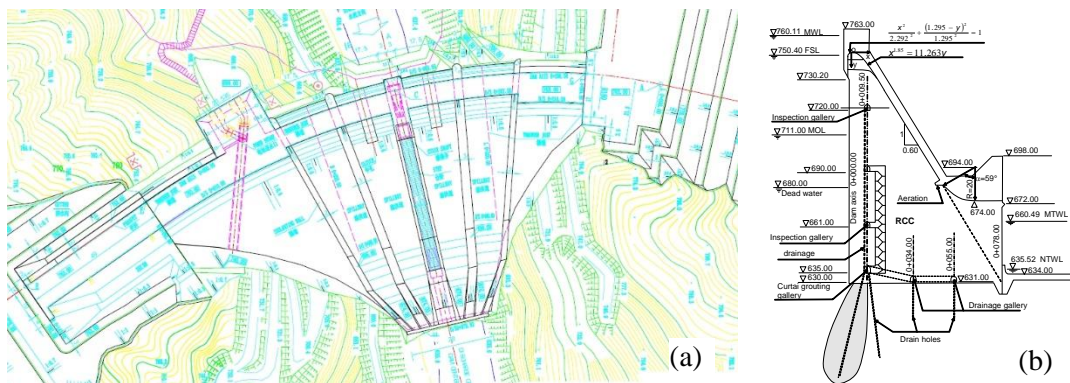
(a) Layout and (b) cross section of Gomal Zam RCC arch-gravity dam
